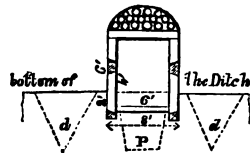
shows a longitudinal, and Fig. 126 a transverse, section of the covered caponniere. It is formed by two rows, some 8 or 10 feet apart, of trunks of trees, or stout beams, not less than a foot thick, planted vertically in the ground, touching each other and pierced with loopholes at intervals of 3 feet. The roof is a timber framework, supporting several layers of fascines, which are covered over with a foot or two of earth.
